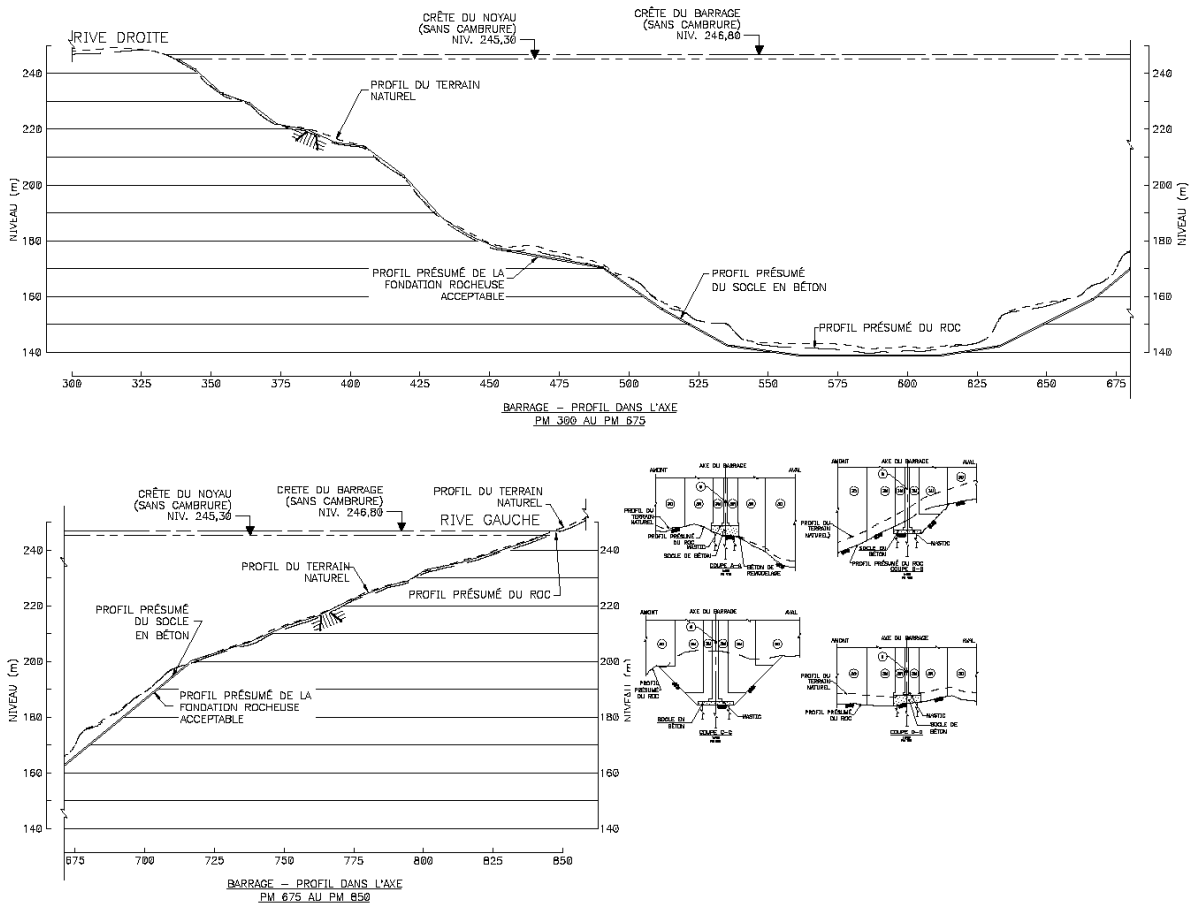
Romaine-2 Dam – Longitudinal Profile and Concrete Sill Foundation Preparation
